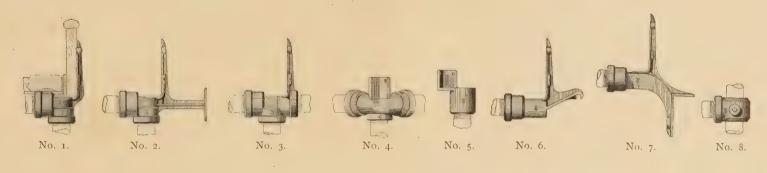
DETAILS OF CONSTRUCTION of our IRON ROOF FRAME in connection with Wood Post Houses.
